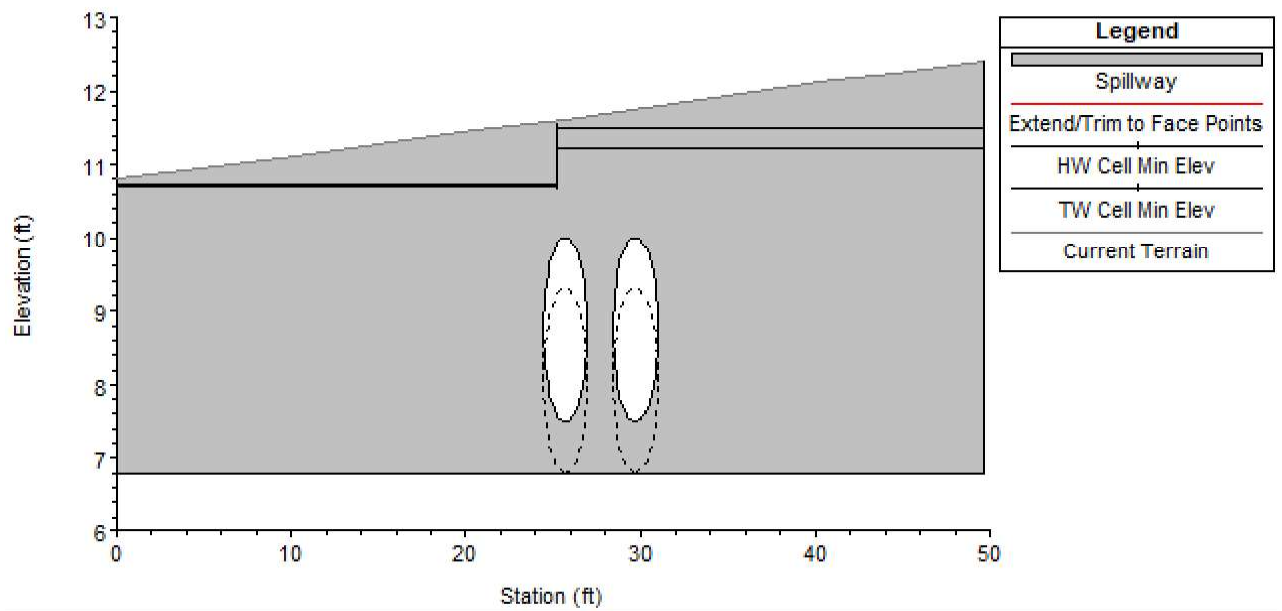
Proposed Culvert #1 Cross-Section on Kaihalulu East Roadway
